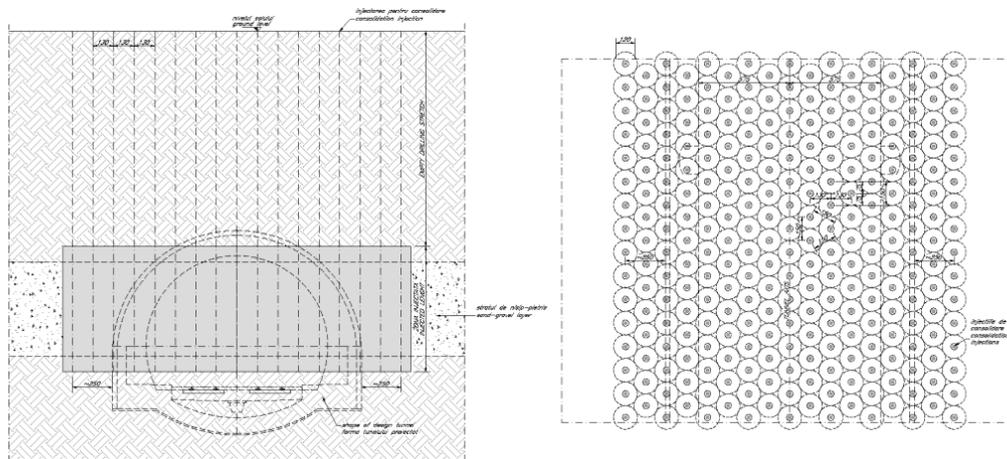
Initial cross section – underground execution<sup>[4]</sup>
